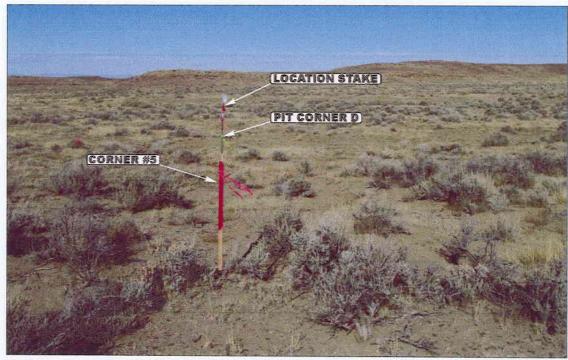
PHOTO: VIEW FROM CORNER #5 TO LOCATION STAKE
